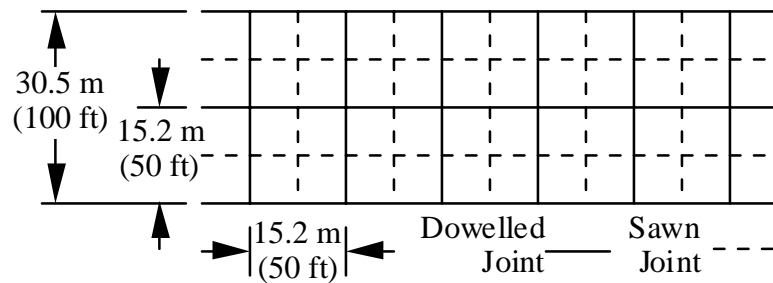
Plan View of Typical Section of Taxiway L, DFW International Airport
